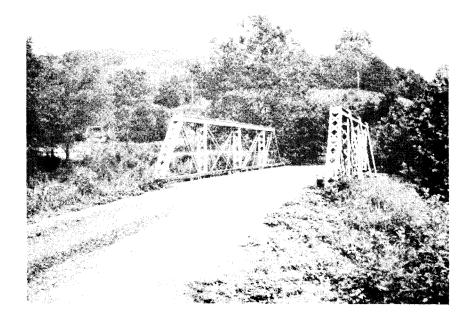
Single-span, low Pratt, half-hip truss bridge in Rockbridge County; built by Variety Iron Works, Cleveland, Ohio; date unknown. (See form/photo number 08-81-15.)
